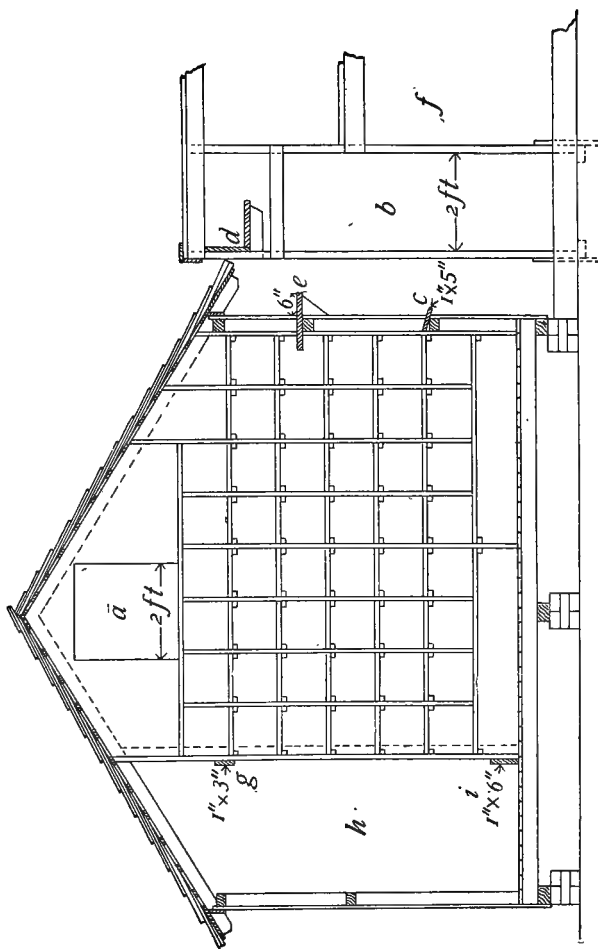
INTERIOR OF A HOUSE, SHOWING ARRANGEMENT OF NESTS AGAINST PARTITION.
